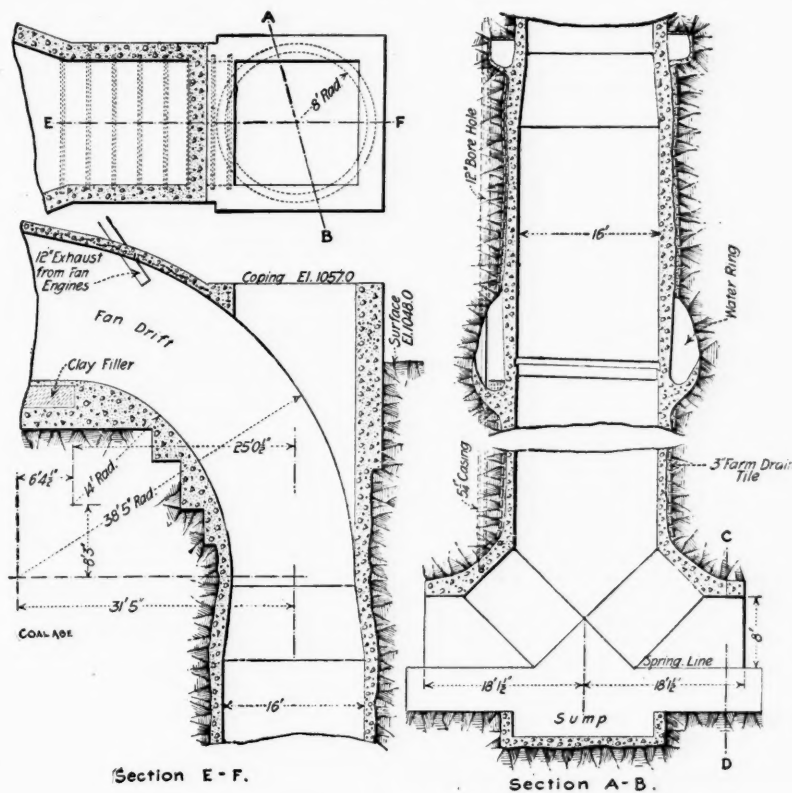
SECTIONAL VIEWS OF AIR SHAFT AND FAN DRIFT
